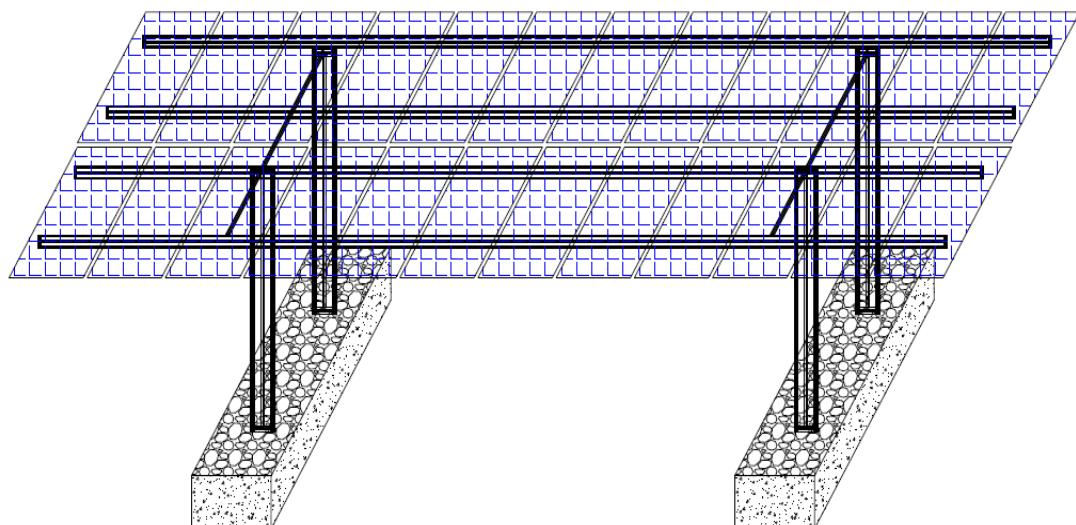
Aluminum construction and concrete foundation cross sectional drawings.
